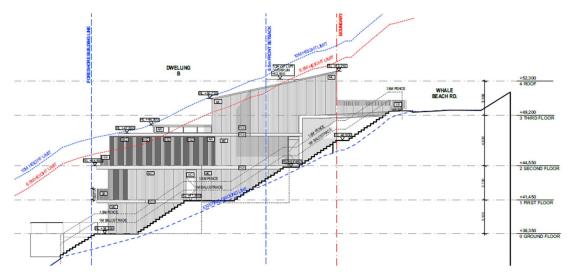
Extract of West Elevation of Dwelling B with 10m height plane to existing natural ground shown in blue Source: Bureau SRH
